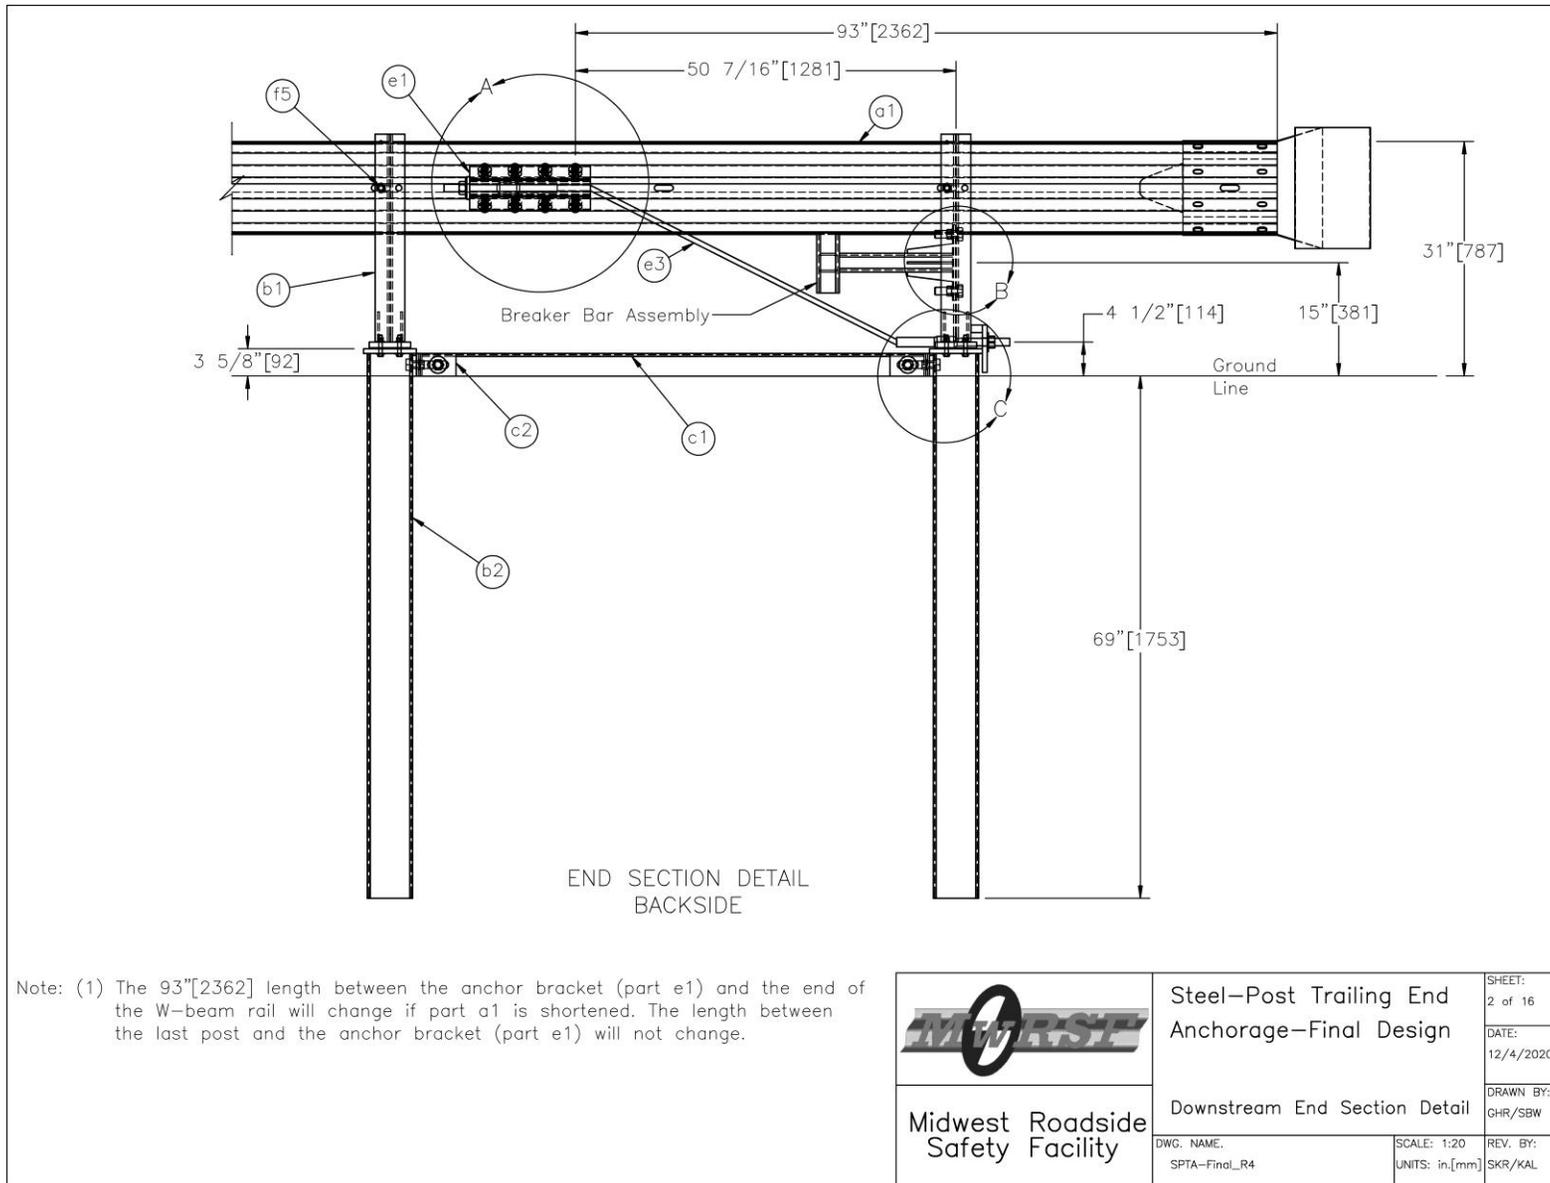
Steel-Post Trailing End Anchorage, Downstream End Section Detail
